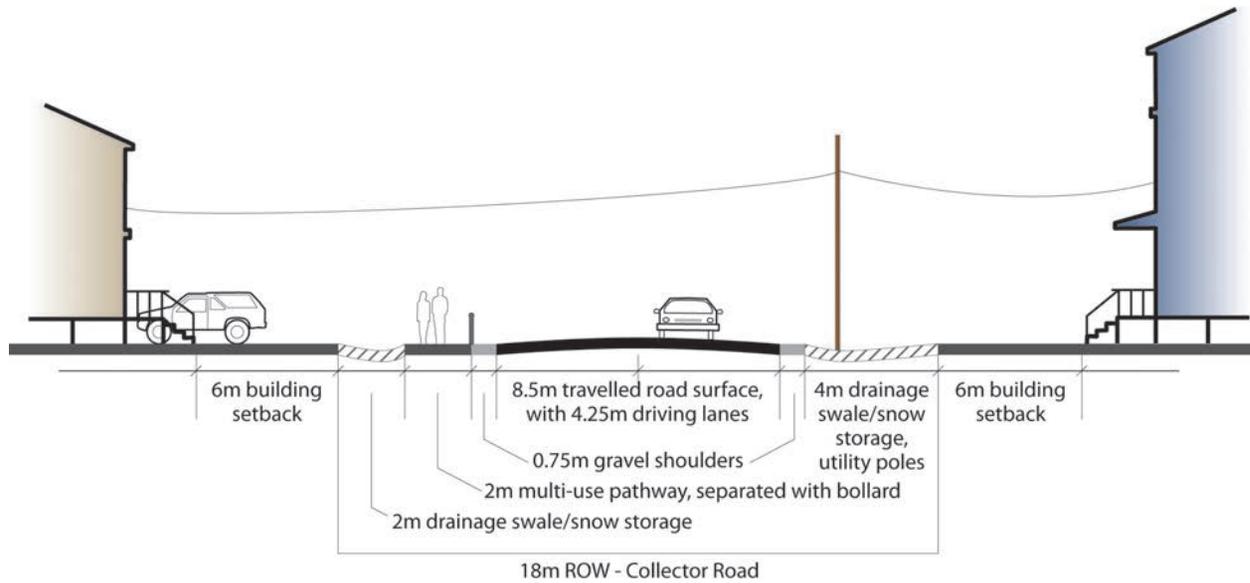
Collector road rights of way on trucked service should be at least 18 metres wide to allow for road lanes, shoulders, pedestrian walkways, drainage ditches and utility poles.
